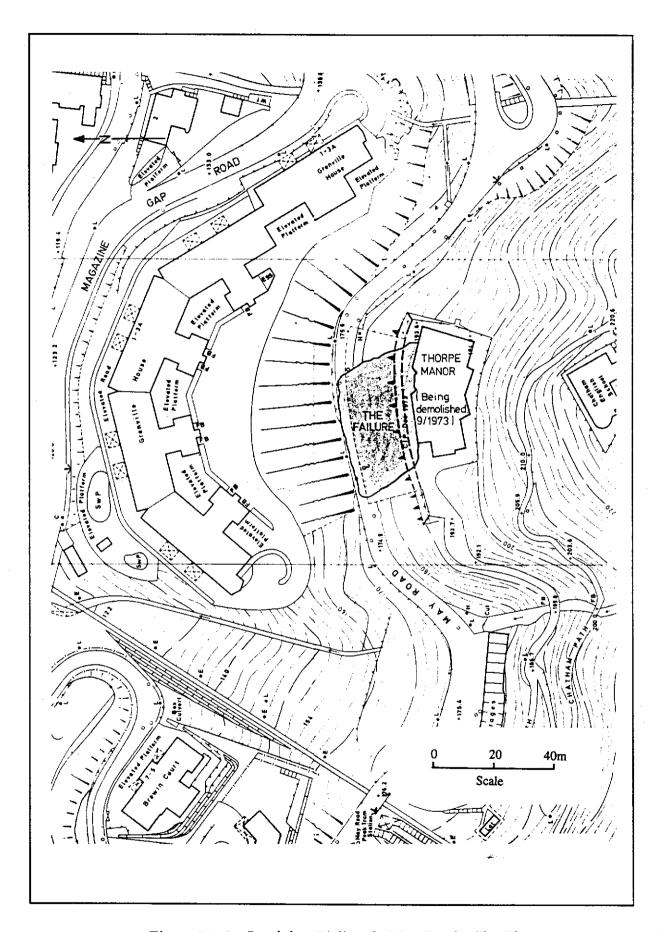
Retaining Wall at 1, May Road - Site Plan
